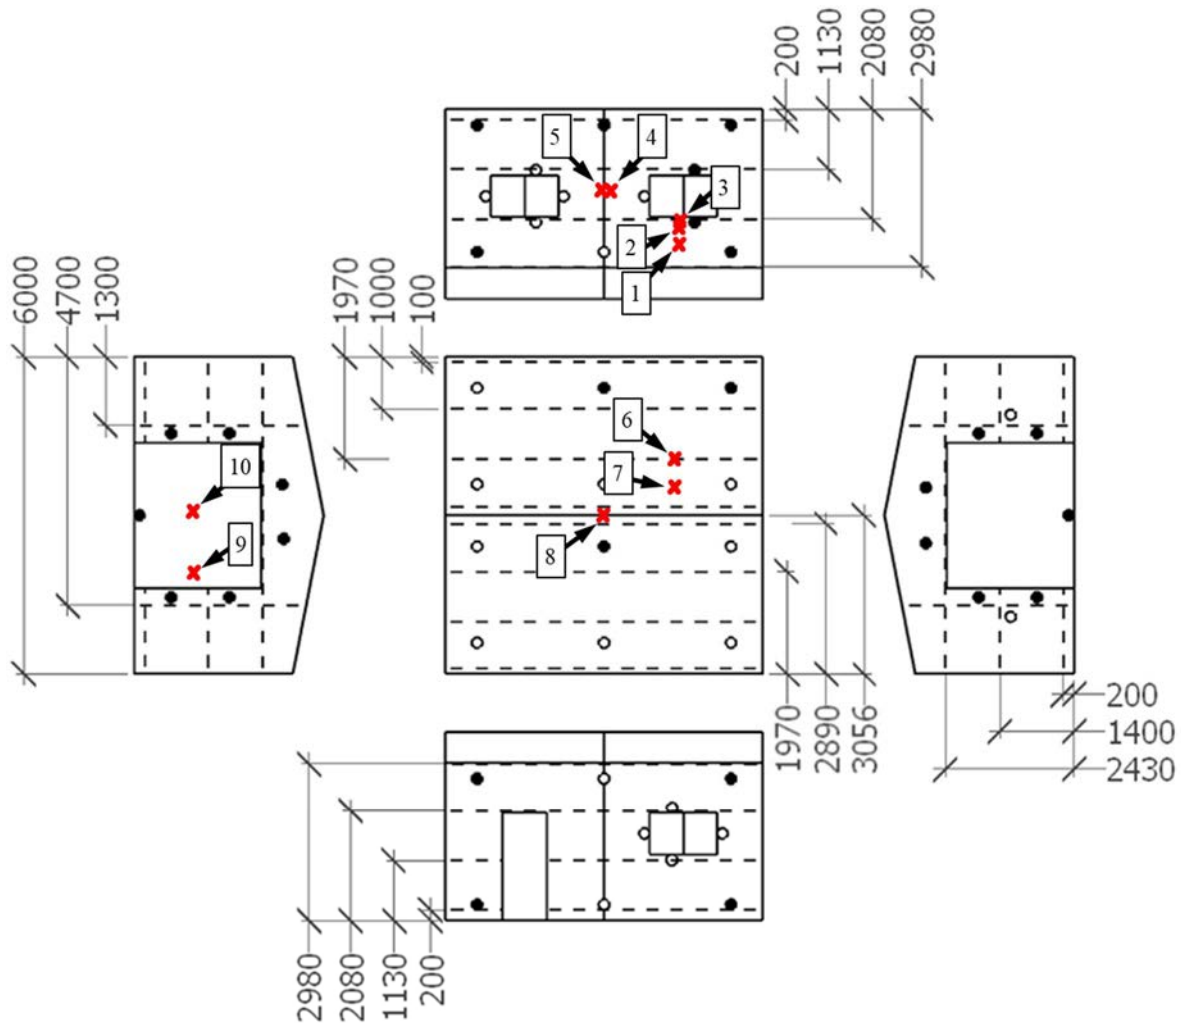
Schematic of LVDT locations – Dashed lines are purlins, girts, and mullions (all dimensions in mm)
